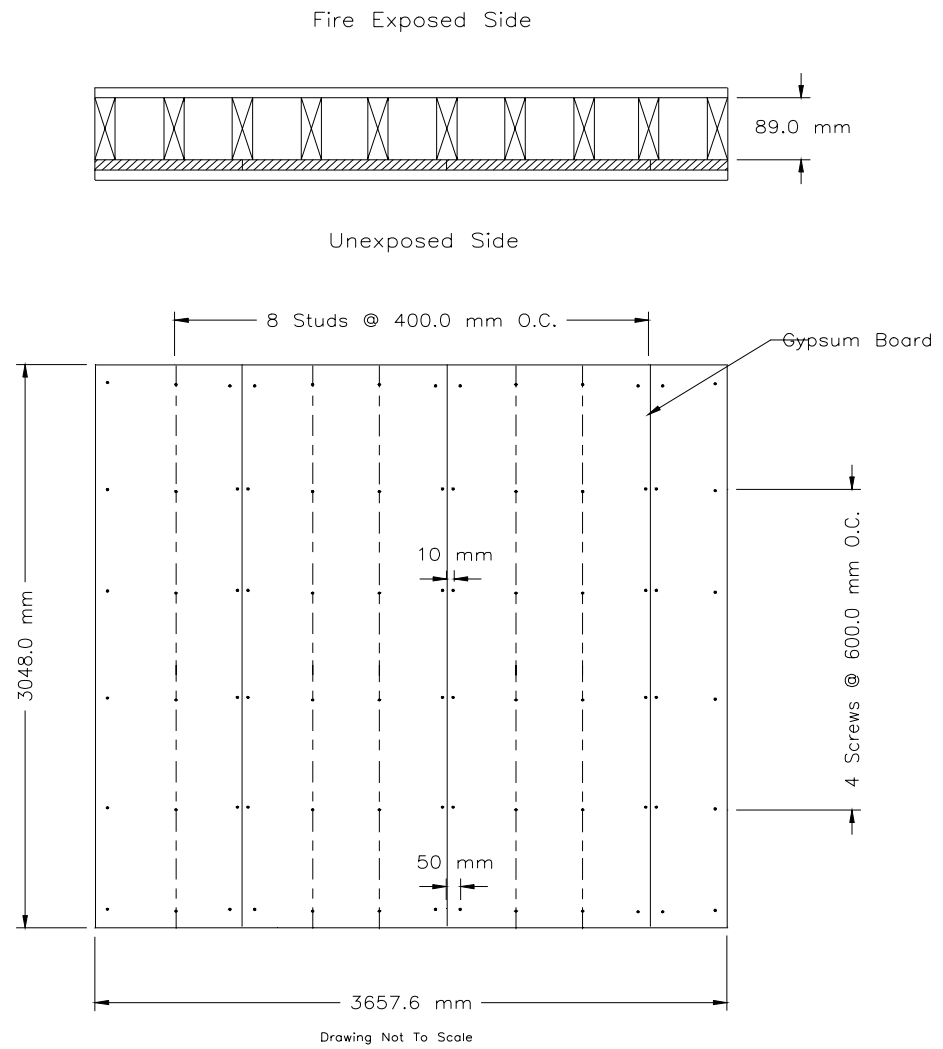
Screw Locations For Wood Stud, 1x2 Gypsum Board Layers, Full-Scale Assembly ( Base Layer, Unexposed side)
